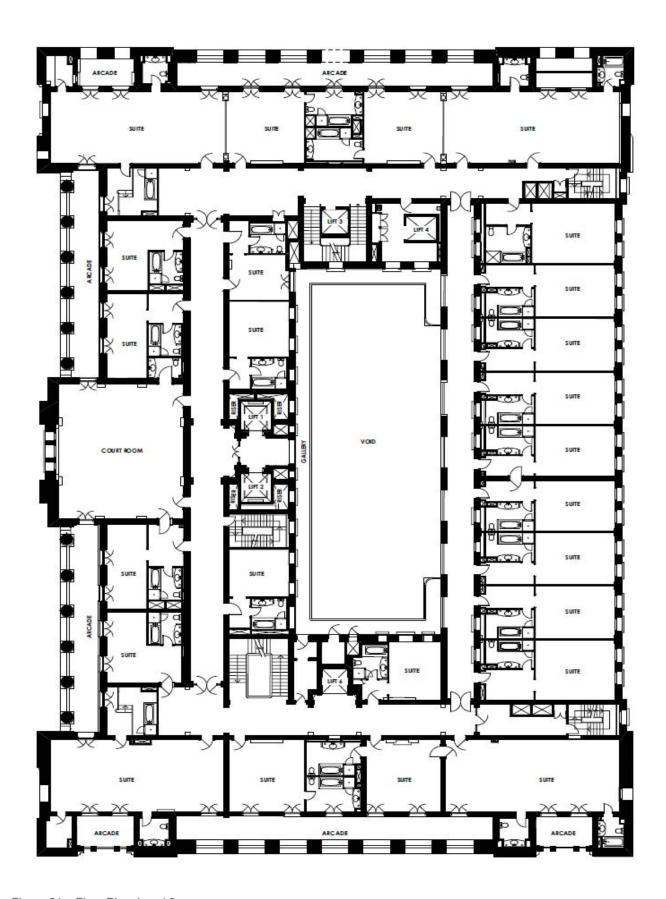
Floor Plan, Level 3 Source: ML Design 2016
